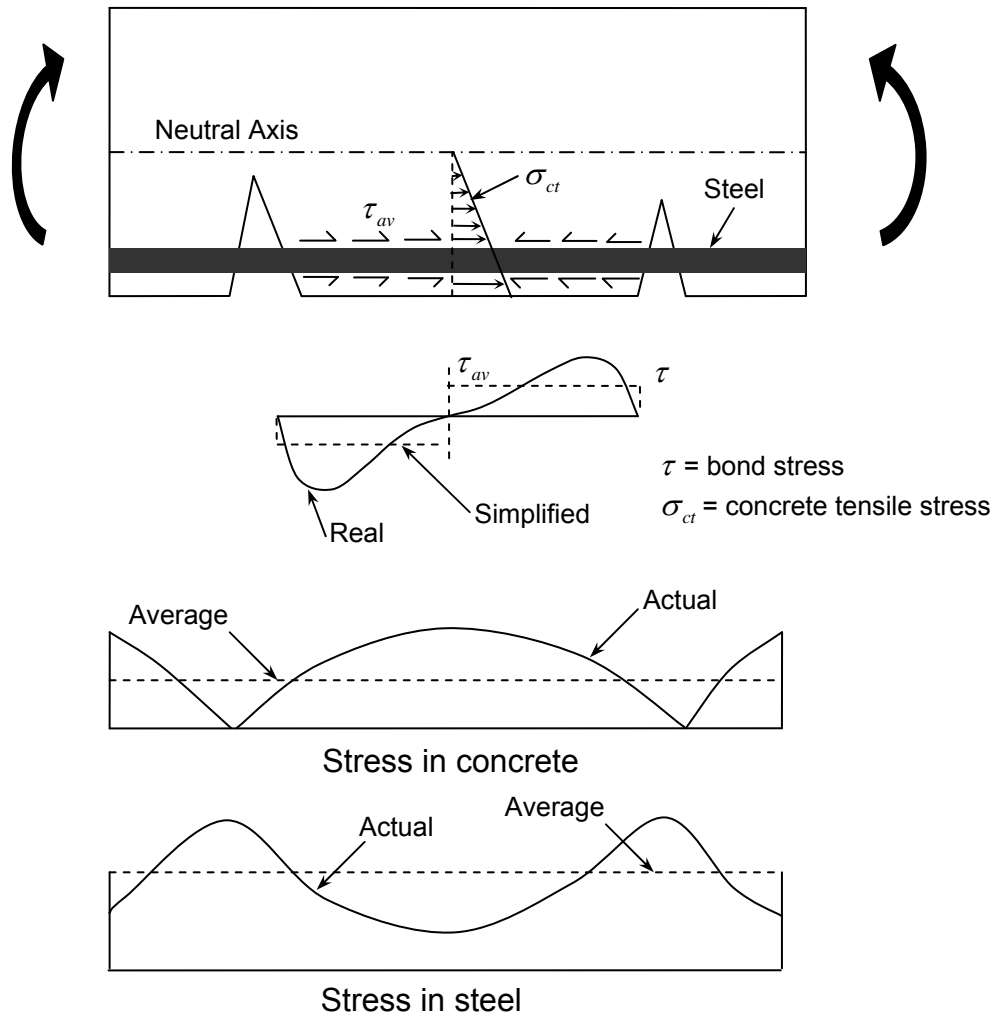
Load transfer from steel to concrete between adjacent cracks.
